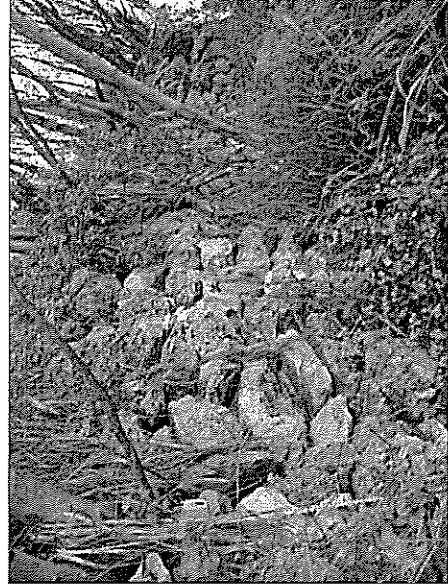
Site 50-80-12-4345, Stone-faced berm for Ewa Plantation railroad, view to the north
